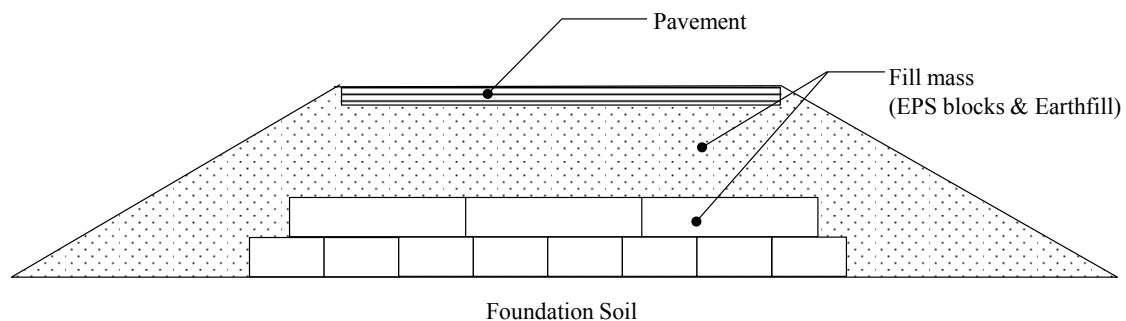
Typical cross section of an EPS-block geofilm embankment.
